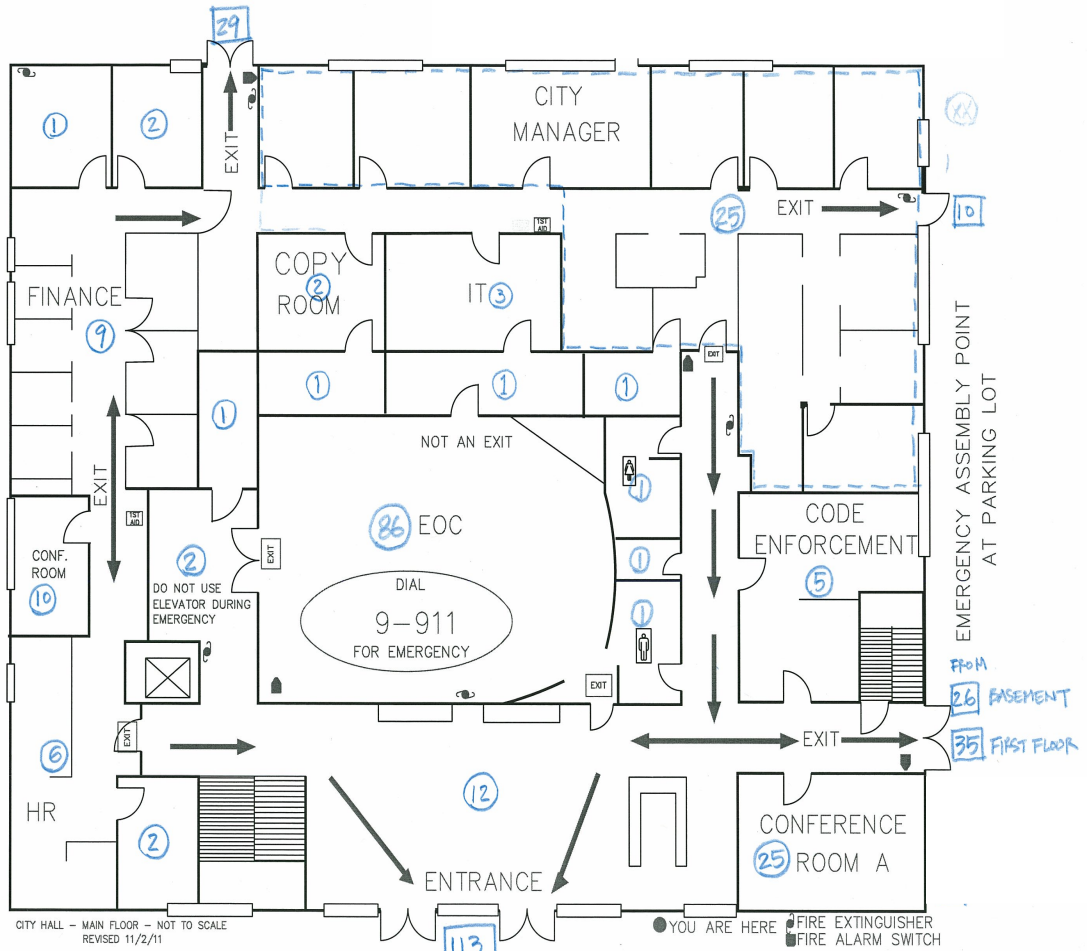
C First Floor Occupancy Load and Exit Diagram
